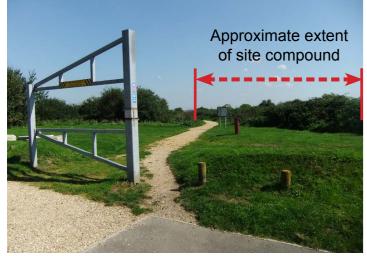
Vehicle access gate on Moorings Way, looking east along the gravel path towards the harbour. This route to be used as a site access road and compound/storage area set towards the harbour
